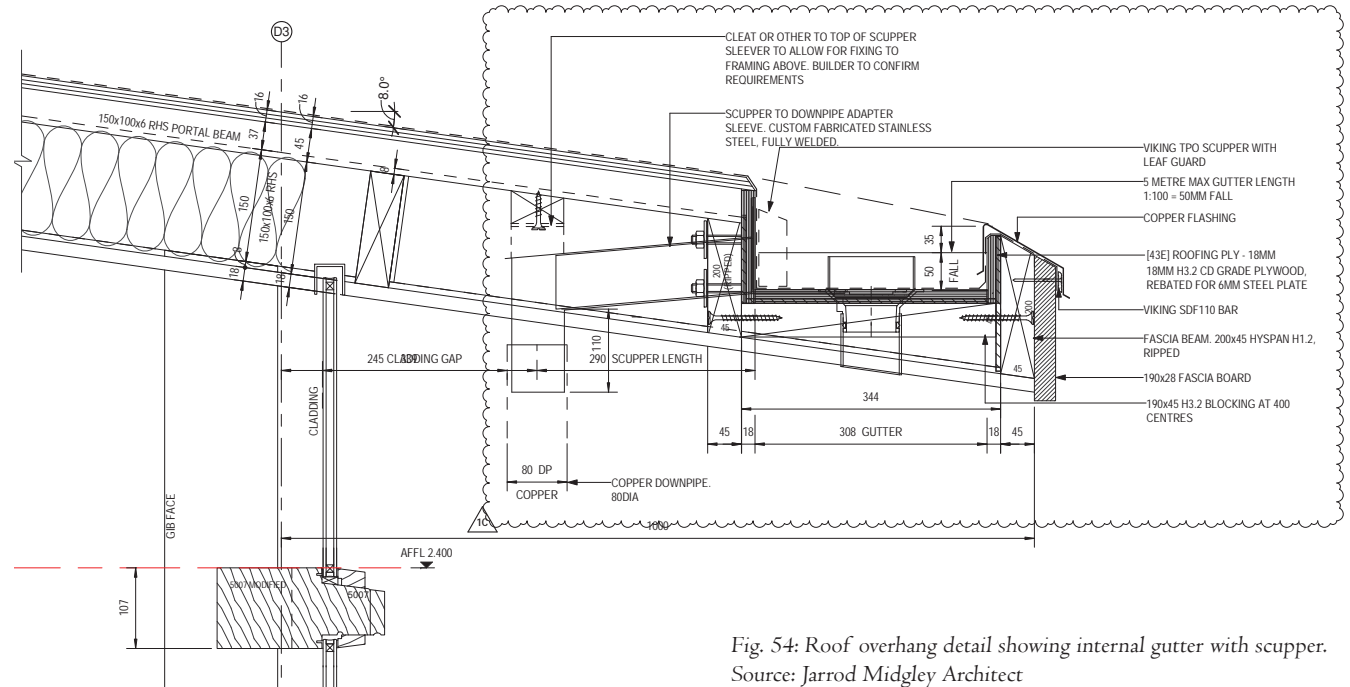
Roof overhang detail showing internal gutter with scupper.
